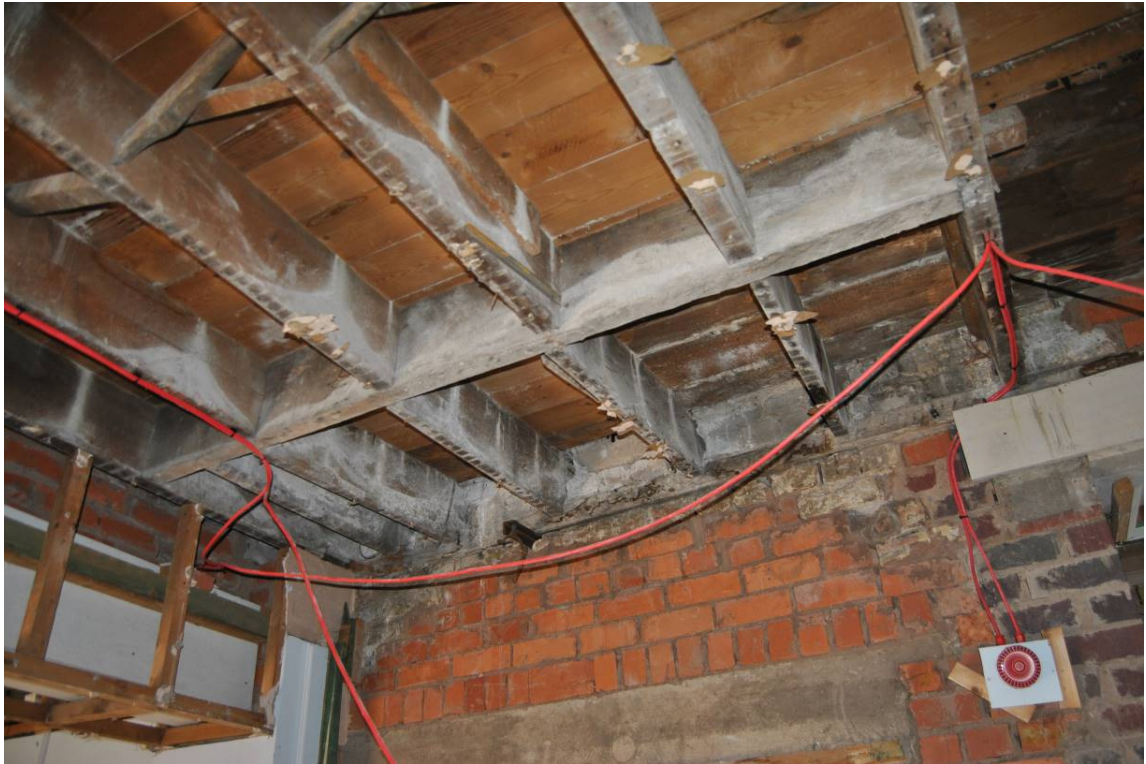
Trimmer of former stair at Bay 2 (N), Building C.
